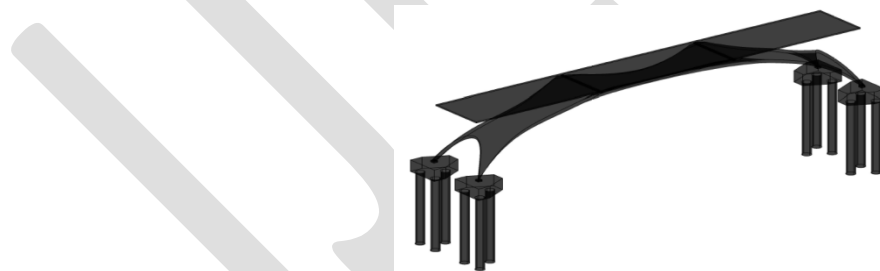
Shell supported bridge with pile foundation modelled in Autocad 2015
